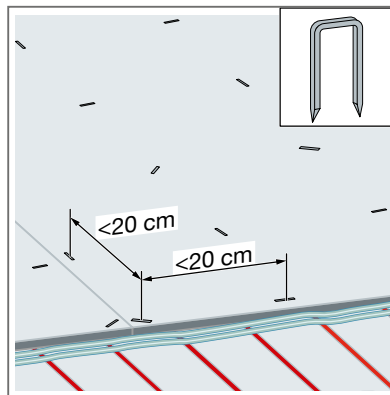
Use expanding clamps to fix the gypsum fibre construction panels
